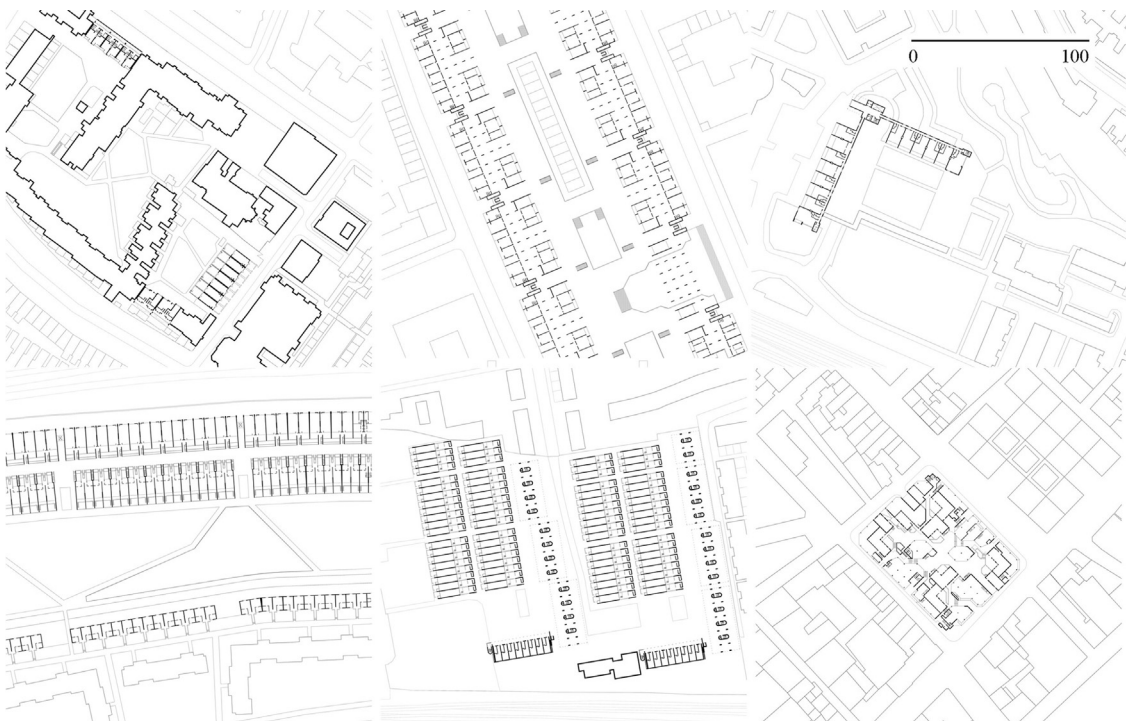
Ground level plan. From top left: Lillington Gardens, Brunswick Centre, Trellick Tower, Alexandra Road, Maiden Lane, and Odhams Walk. Ground floor plans. Source: drawing by Gerardo Semprebon, in cooperation with D. Fusari, M. Ignaccolo, M. Mikaelyan.
